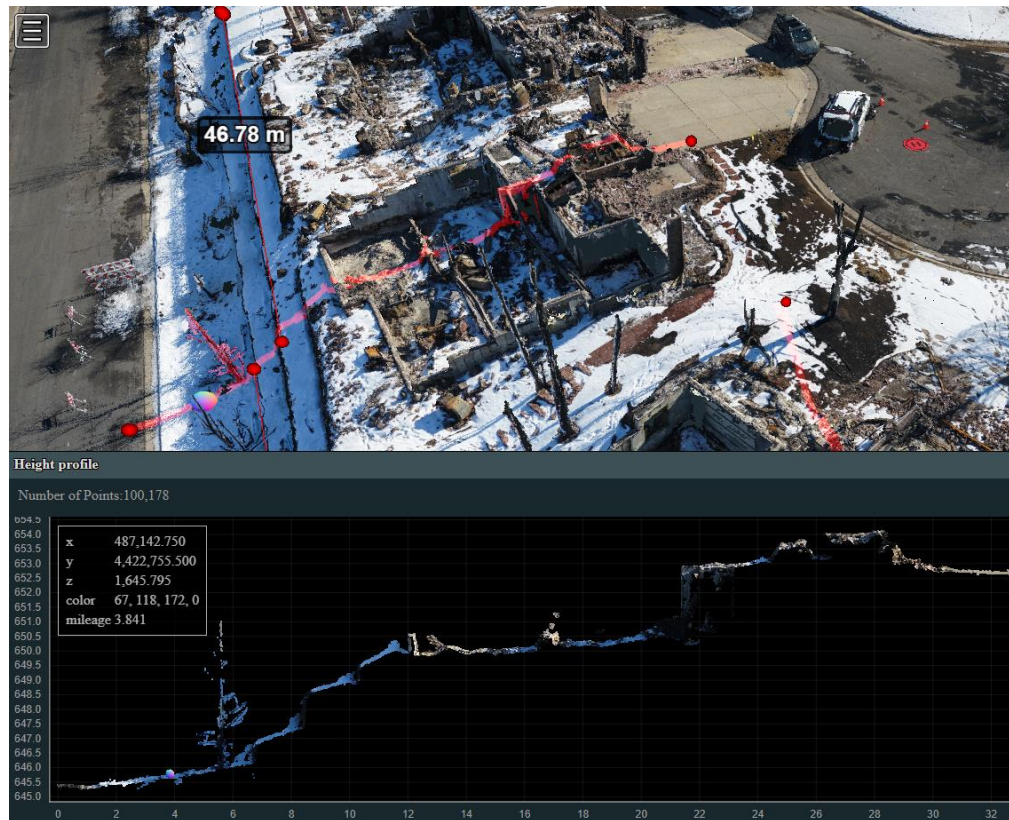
RS1 Profile A, section of North Wall extending from St. Andrews Lane to the RAPID mobile equipment vehicle on Troon Ct. (39°57'16.4" N, 105°09'01.4" W)
